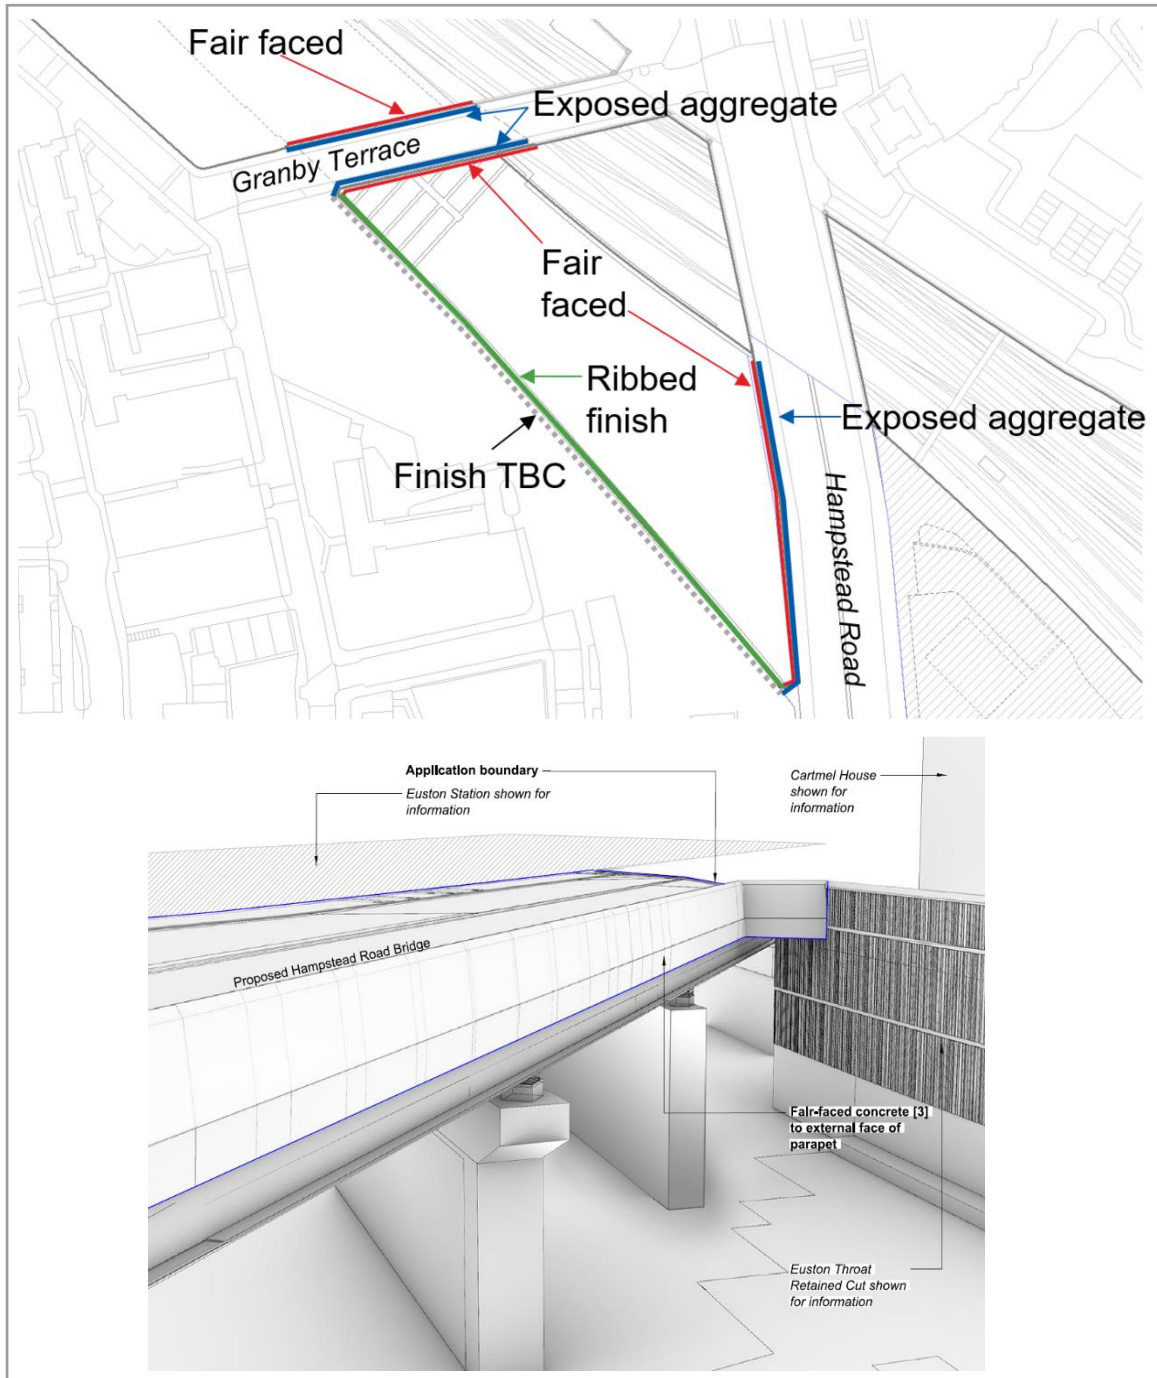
The parapet finishes for HRB, ETRC and GTB (top). An extract from perspective 6 of the Parapet Details drawing submitted with this application (1MC03-SCJ\_SDH-AR-DDE-SS01\_SL12-010042) which shows the inside face of the interface with ETRC (bottom).
